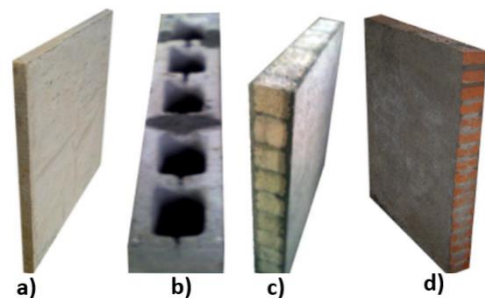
Conductivity test materials: (a) panel wall of ferrocement, (b) panel wall of hollow concrete block, (c) panel wall of lightweight concrete brick, and (d) panel wall of red clay brick [13]
